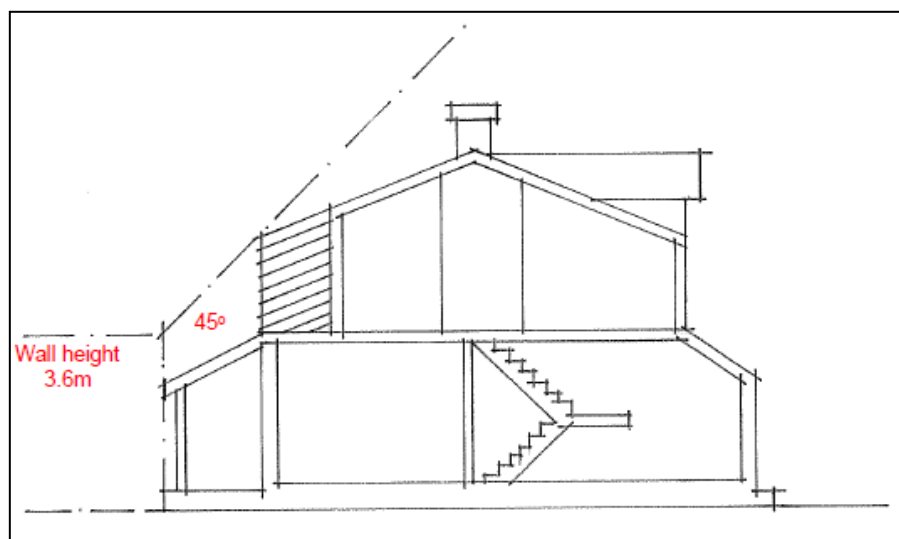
Building envelope – 3.6m wall height – Single storey, or low two storey dwelling utilising the roof space.
